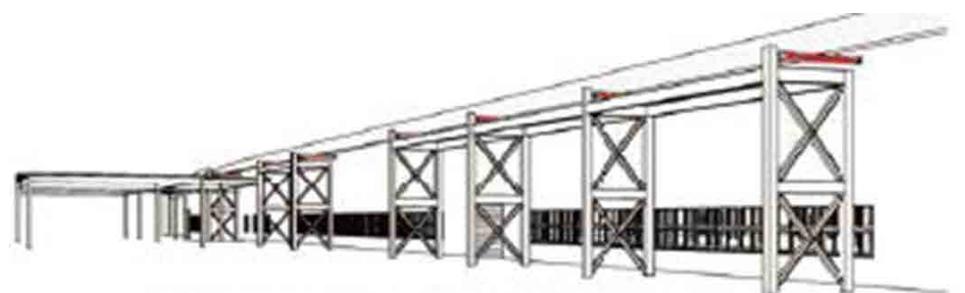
Response-control Buttress Framing Installed Outside of Plant
